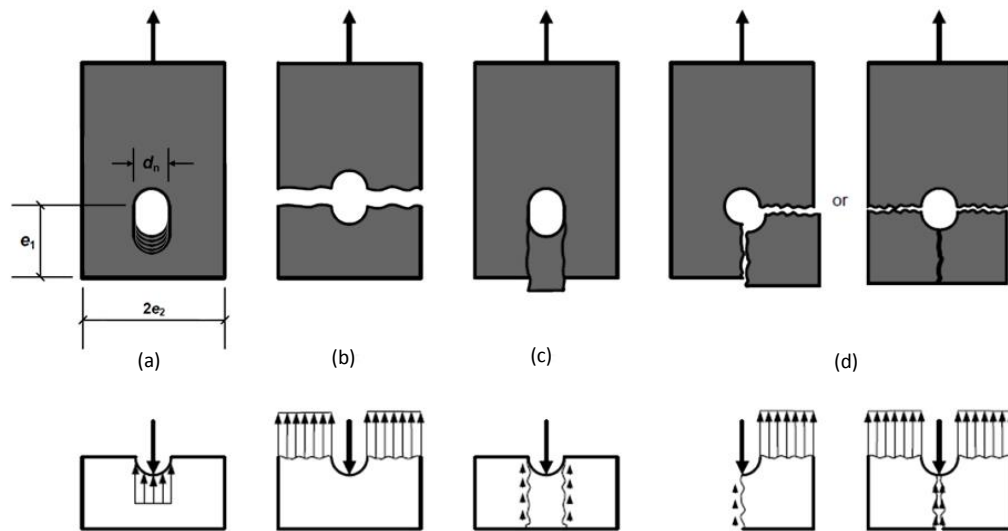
Failure Modes of PFRP Bolted Connections under Shear Loading showing (a) Bearing, (b) Net-section, (c) Shear-out and (d) Cleavage Failure (Mottram, 2009b)
